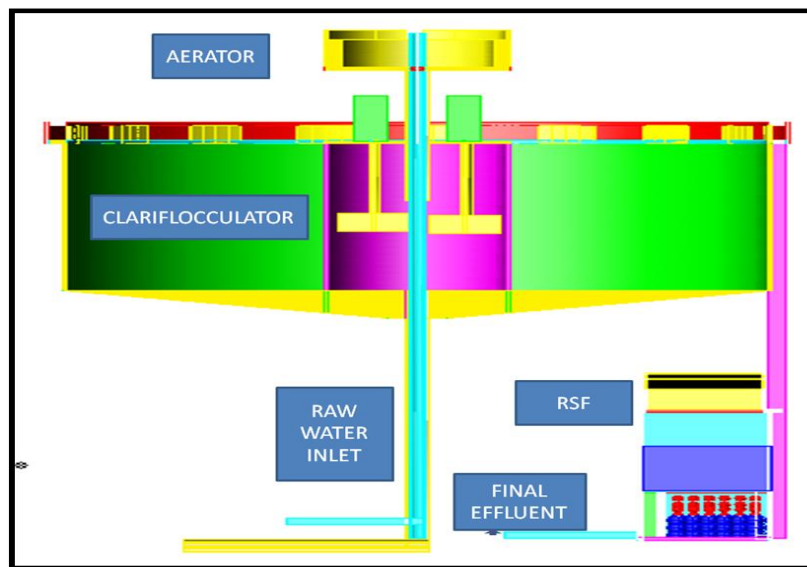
Typical Sectional Elevation of Elevated water treatment plant
